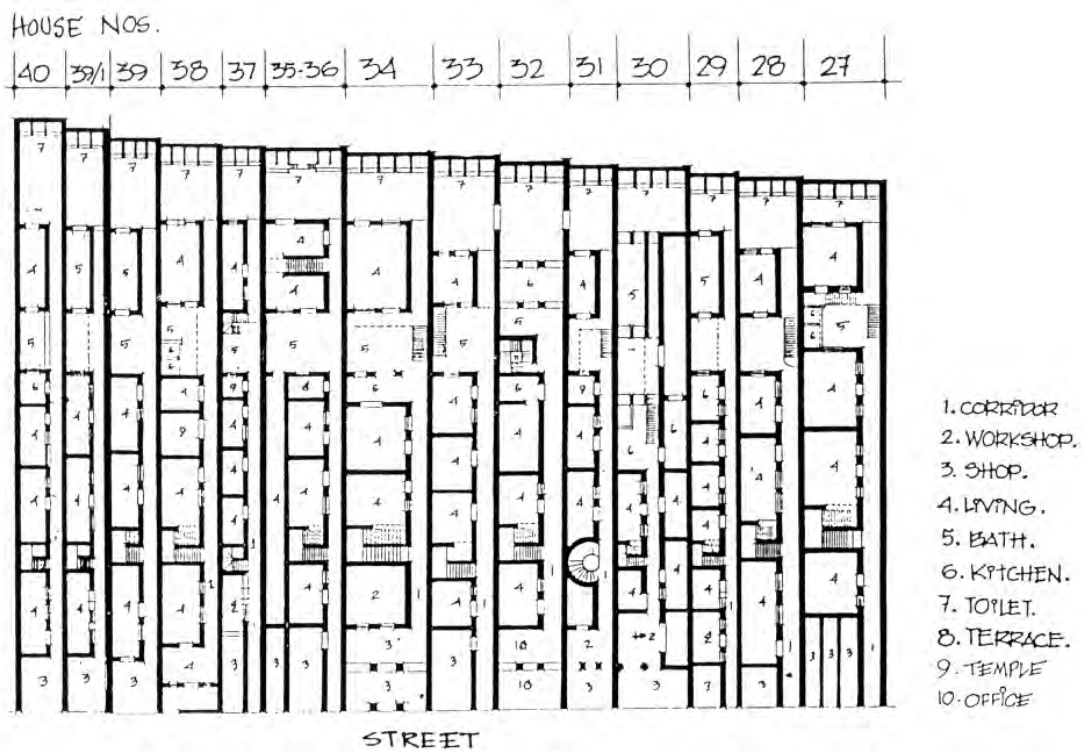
Plan showing the general layout pattern of Shakhari Bazar shop-houses.
